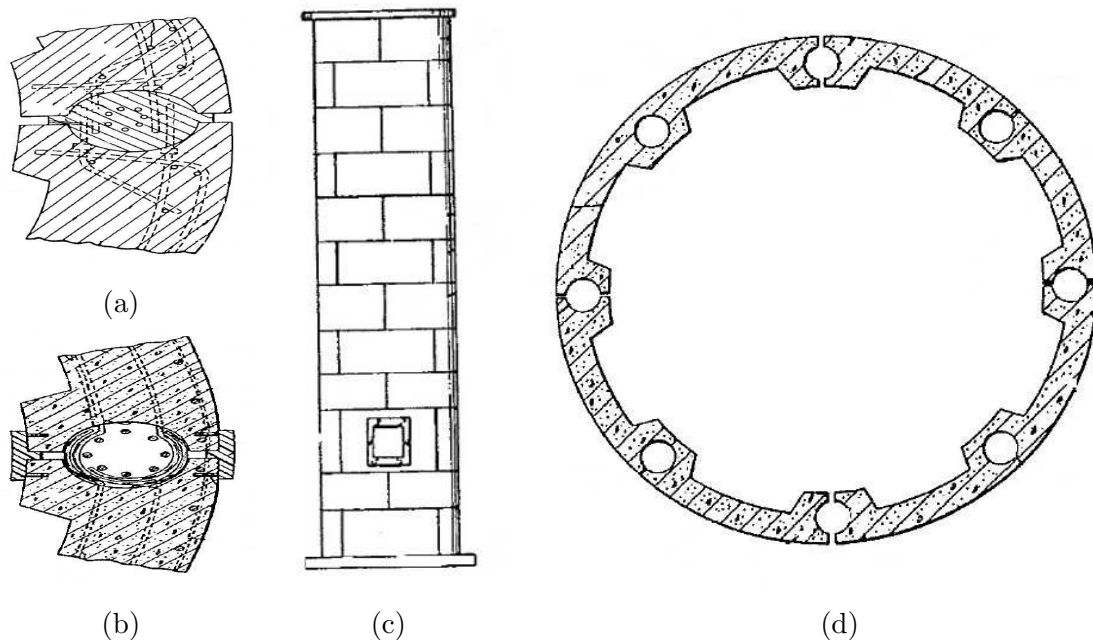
Prefabricated modular tower, taken from [30]; (a) and (b) proposed details of vertical joint; (c) assembled tower; and (d) cross-section
